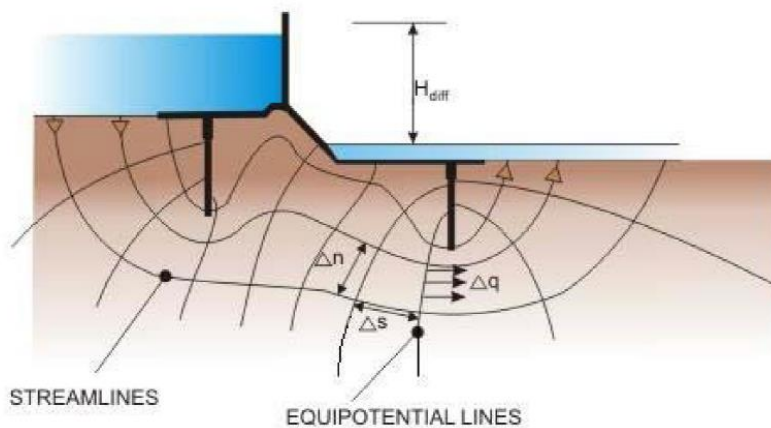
Streamlines and equipotential lines below barrage floors and sheet piles.
